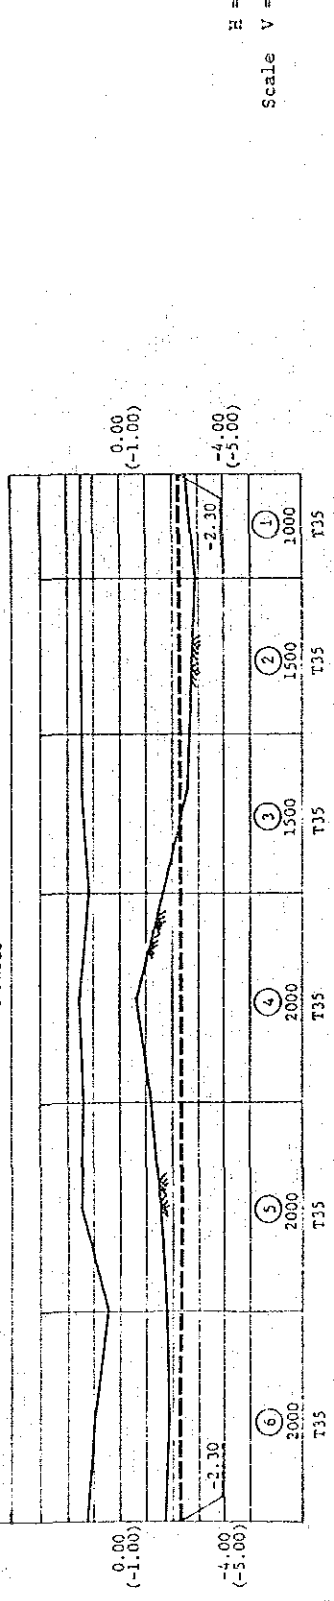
PROPOSED DRAINAGE FACILITIES (BANG NA DRAINAGE AREA)
